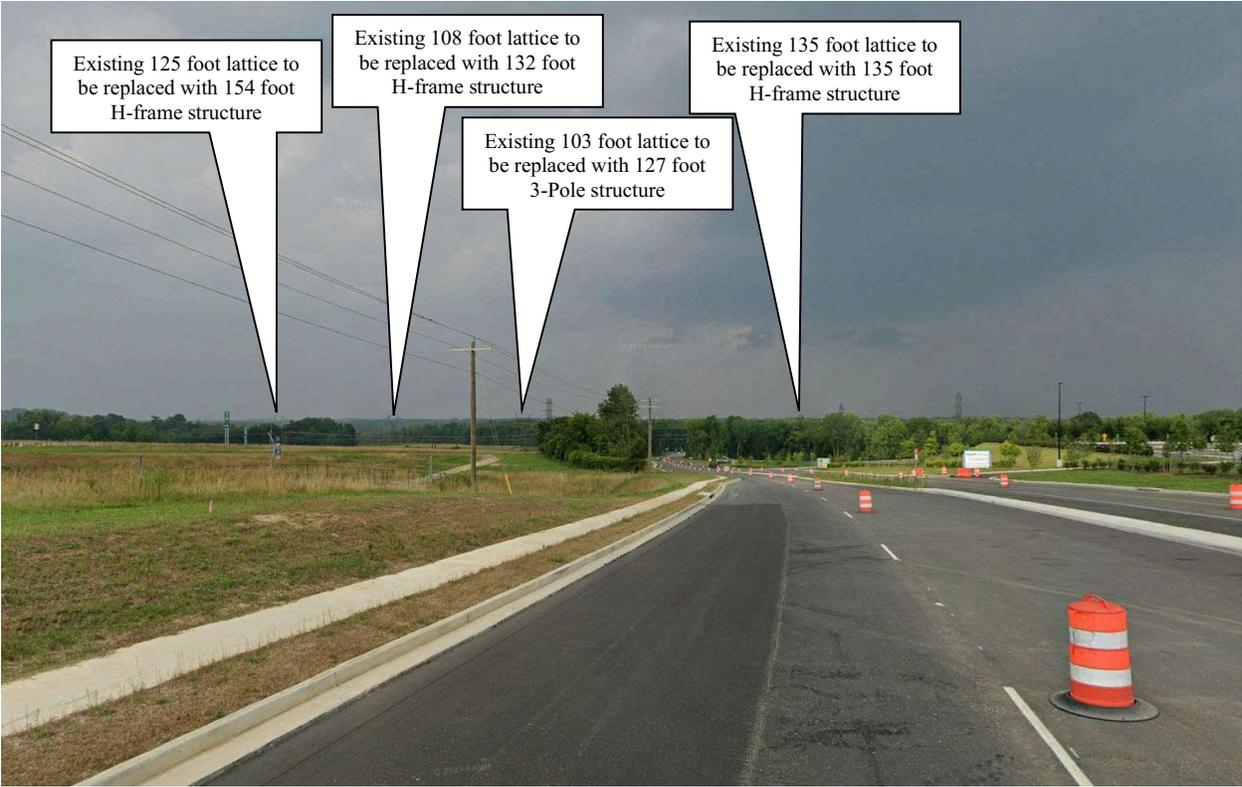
Photo location 1- View from Meadowbridge Road near Richmond Raceway, facing northeast.
